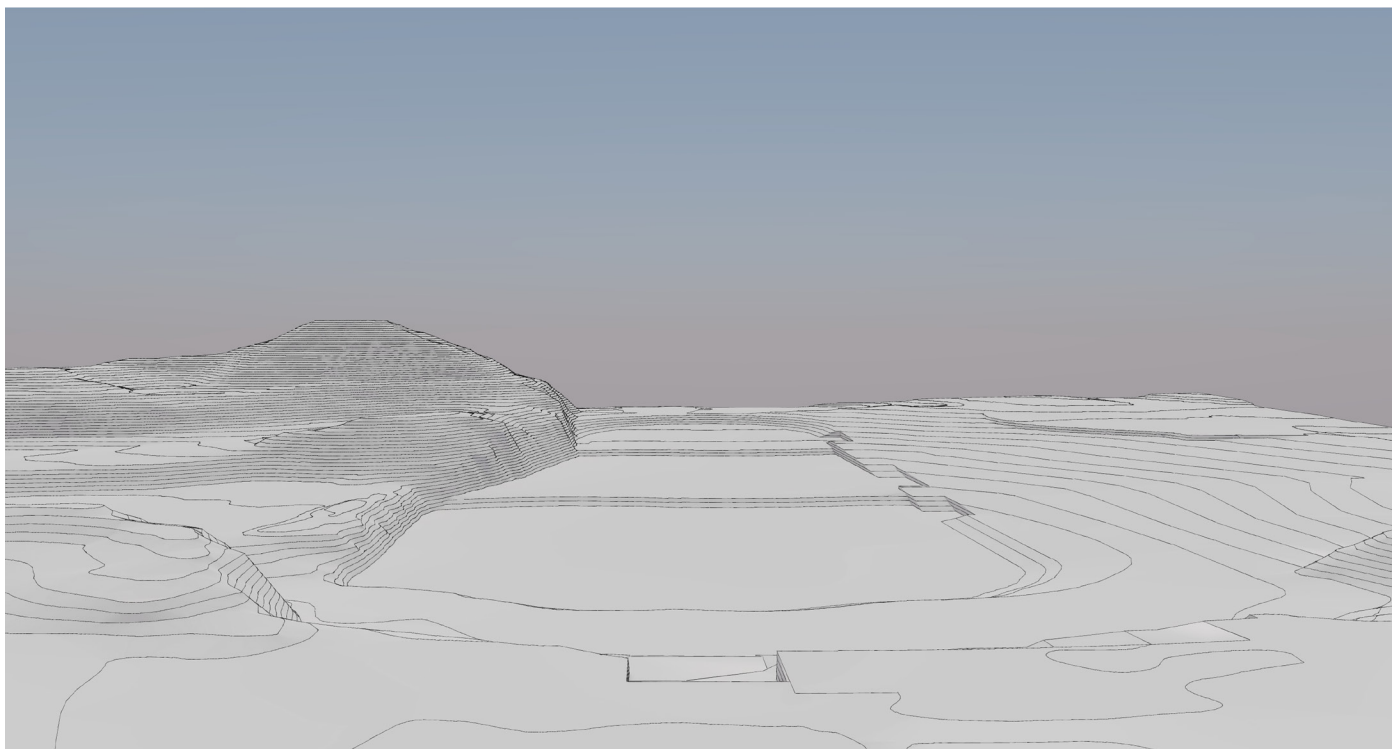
RRA Development Plan – New landform viewed from the Town Centre
